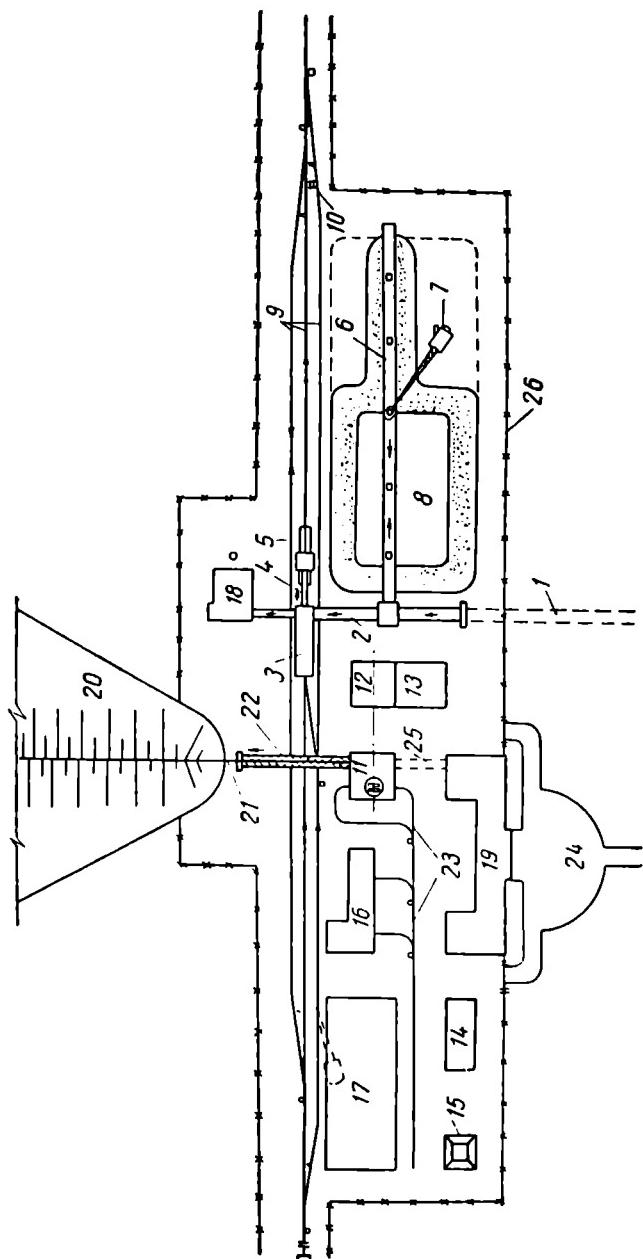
Layout of surface structures in a lignite mine worked through an inclined main shaft
